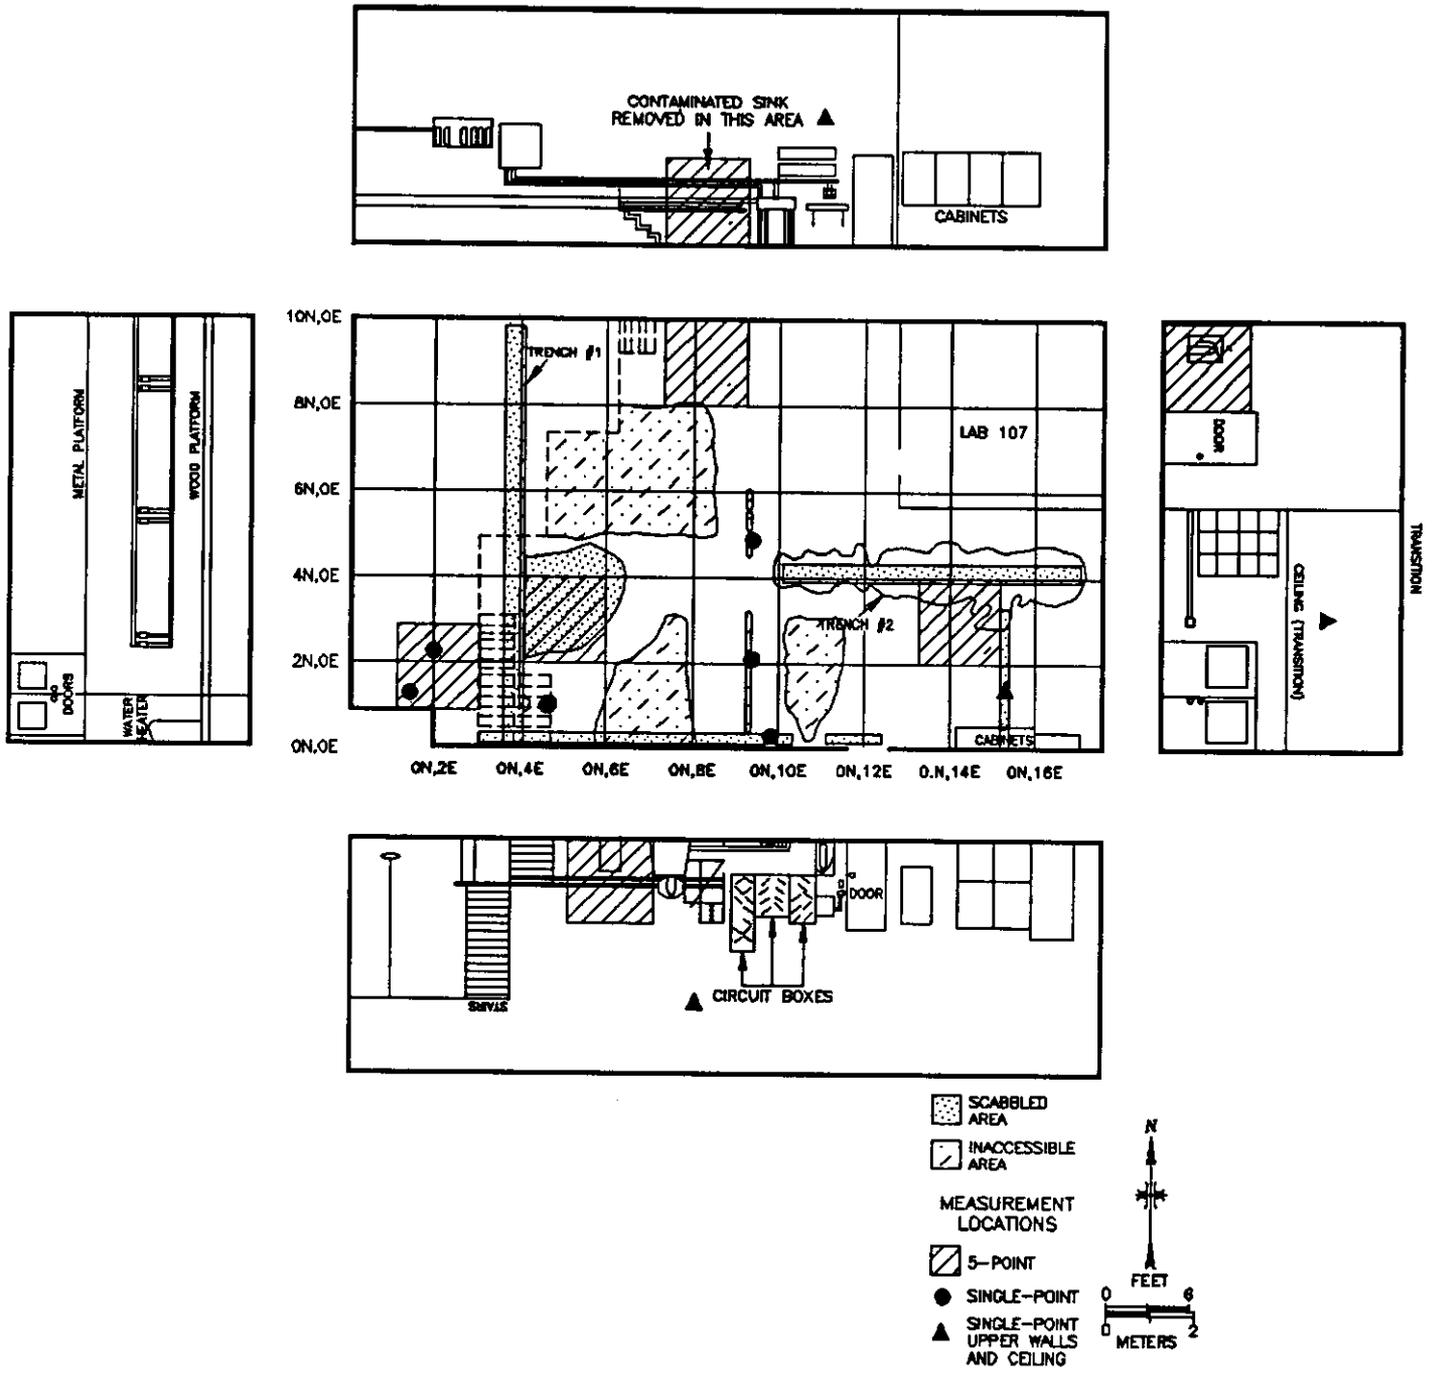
Building 24, Room 106, Indicating Measurement Locations on the Floor, Lower Walls, and Upper Walls
